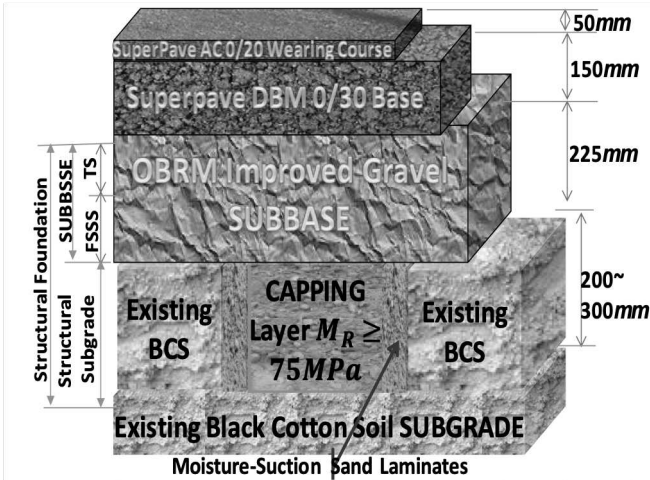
Schematic illustration of Q-M structural subgrade and pavement structural foundation design and definitions: [TS: Transient Section; FSSS: Foundation Support Section]
